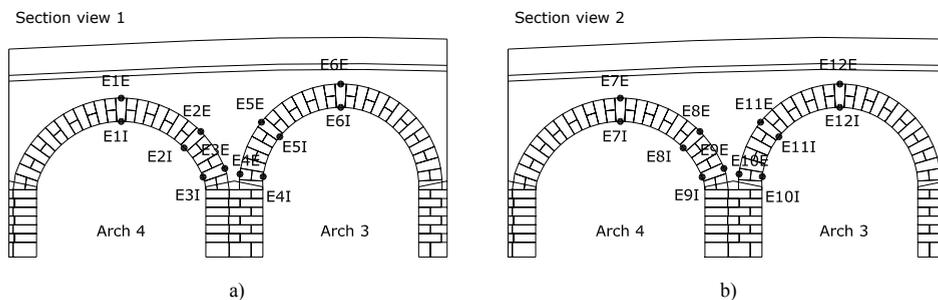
Strain gauge layout. a) Downstream façade alignment and b) central alignment
